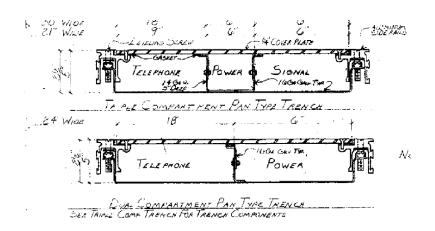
Trench header detail from MacFab WTC7 shop drawing T5 (CANTOR2005517)
